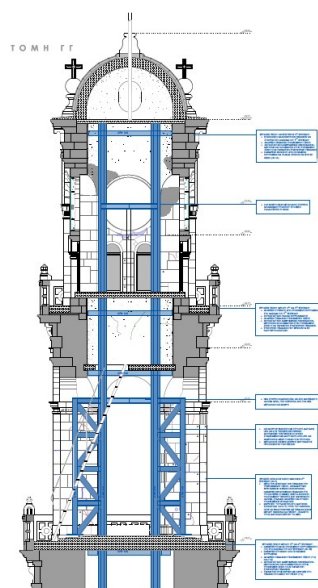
The proposed structural interventions on the Southern Bell Tower.
